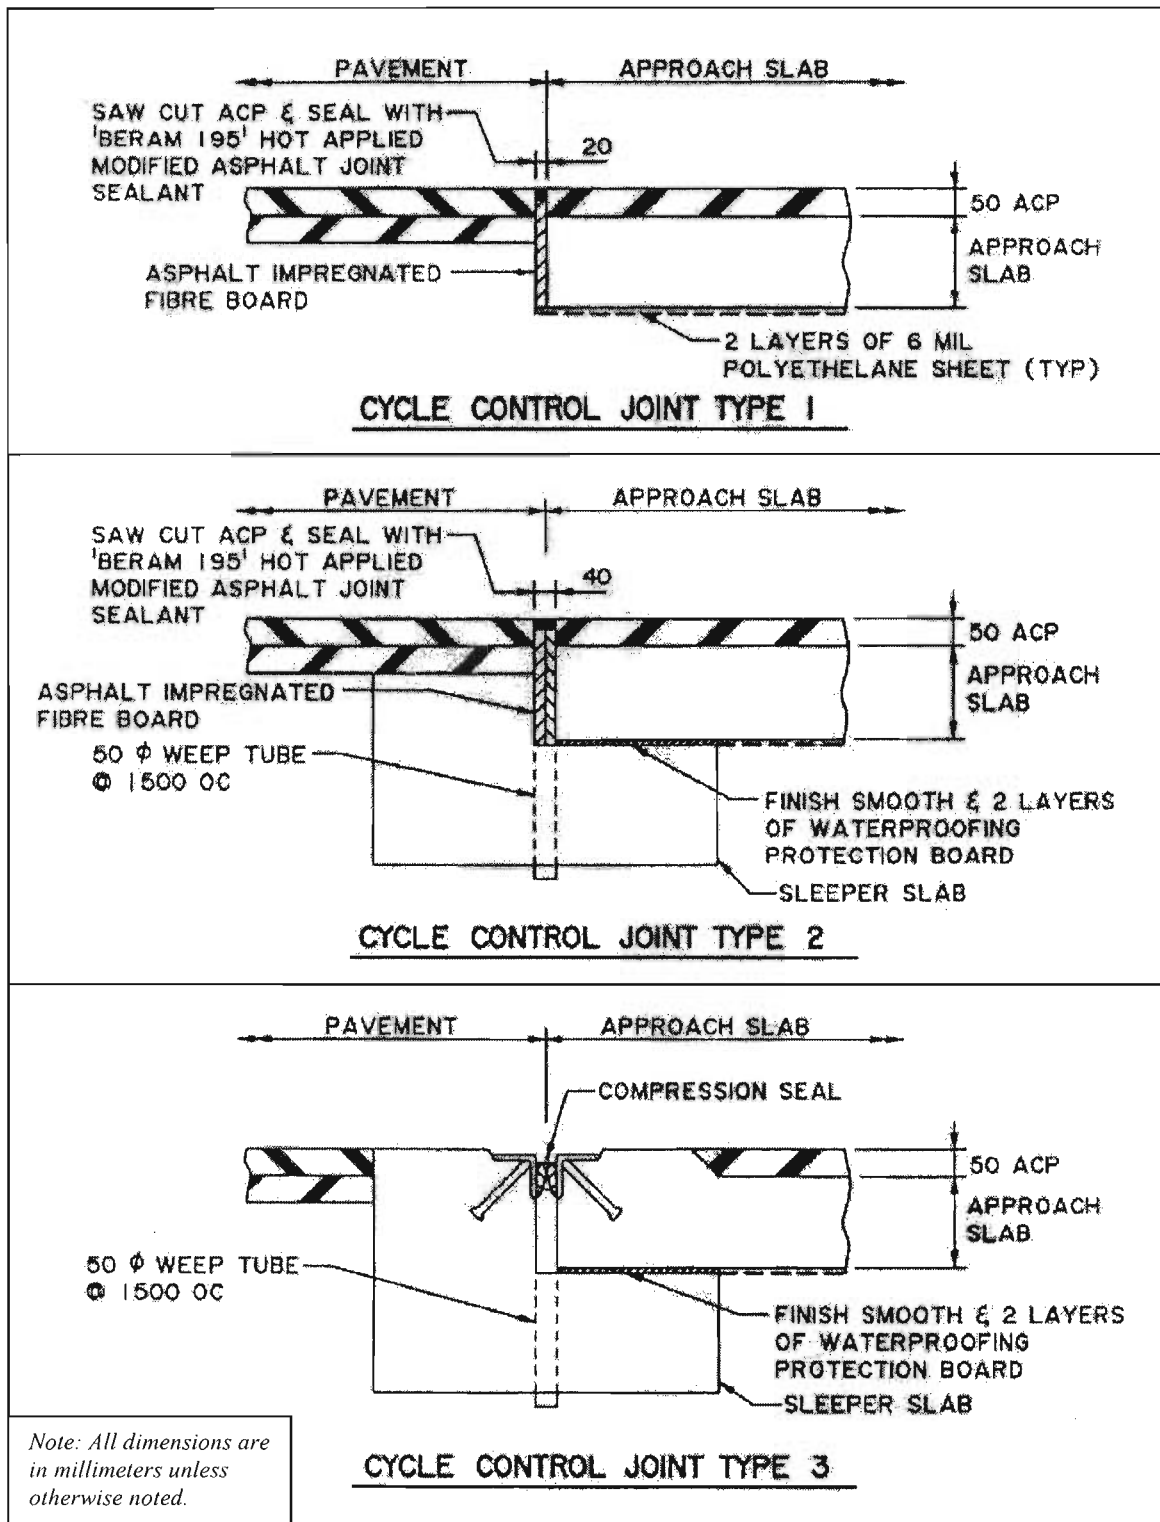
Typical expansion systems for steel and concrete girder integral bridges (Alberta Transportation, 2003)
